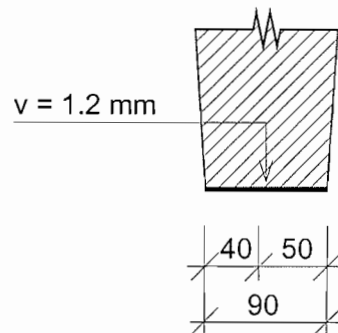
Arrangement of the CFRP plates for beam no.3
